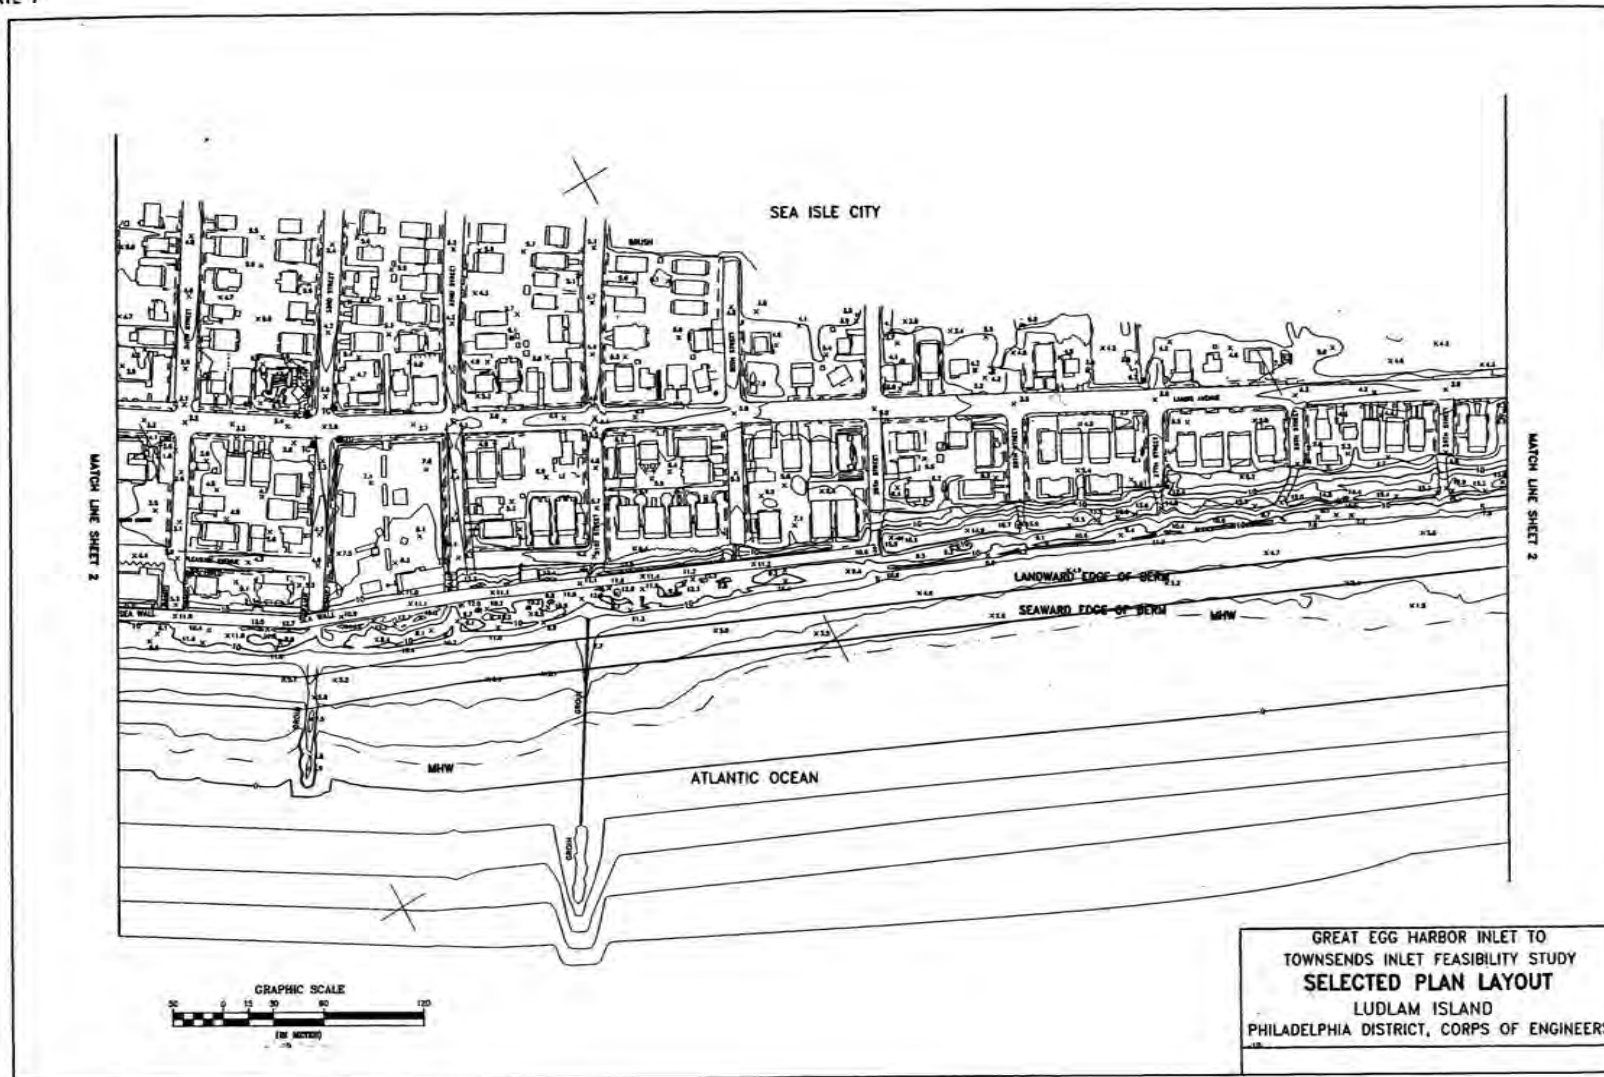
Selected Plan Layout for Ludlam Island, NJ – 25th Street to 34th Street, Sea Isle City
